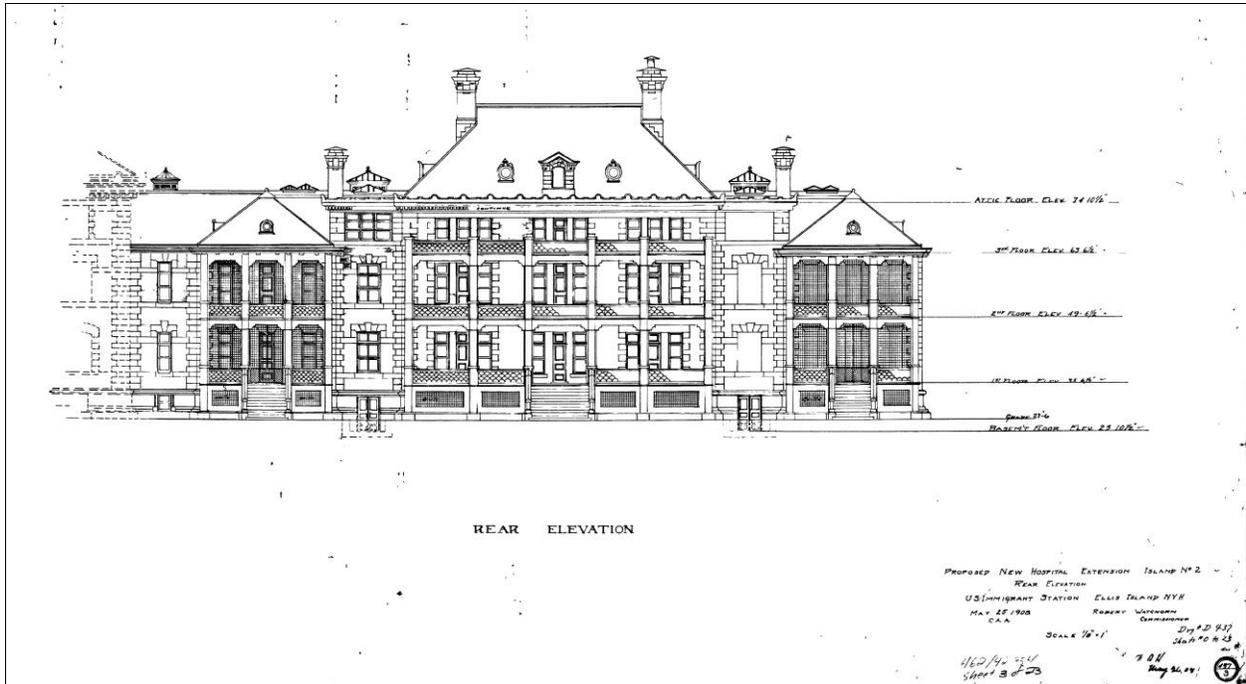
Rear Elevation, Proposed New Hospital Extension (Hospital Building No. 2), 25 May 1908.
